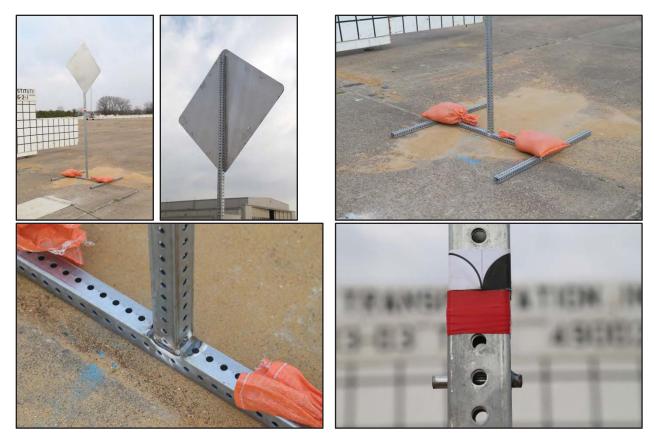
Option A Temporary Work Zone Sign Support Used for Test No. 490026-2-1.
